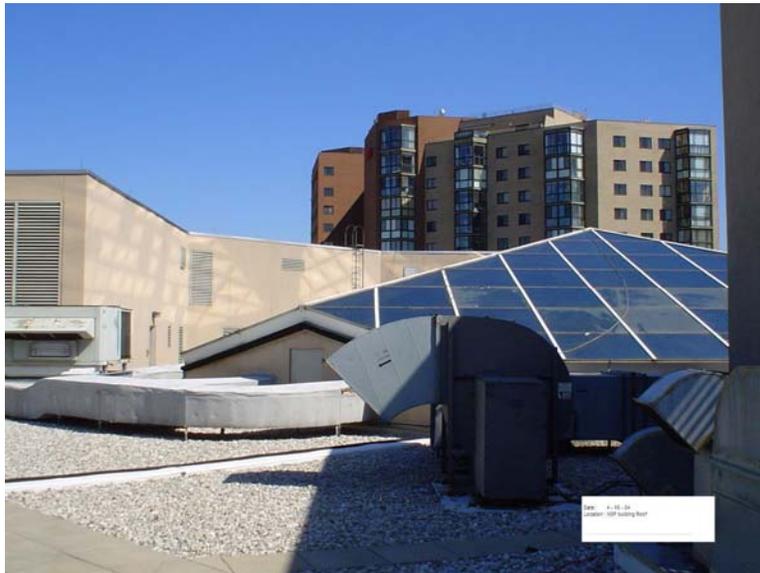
Building exhaust fan located approximately 20 feet from the collection antenna at the NSF location.
